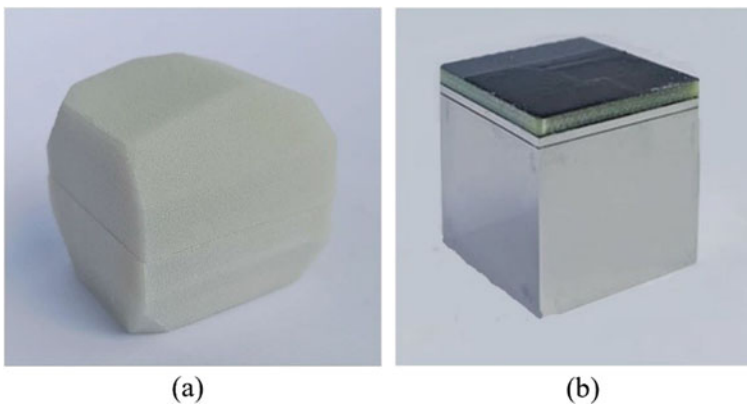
SmartRock components; a 3D-printed shell and b IMU inside the shell
